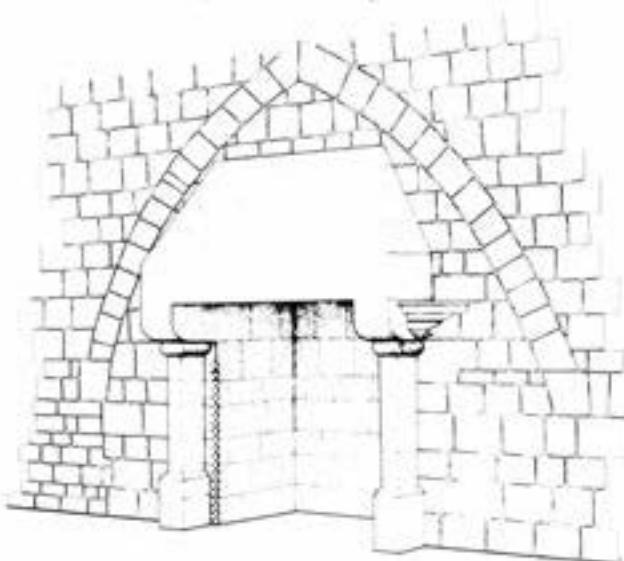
The keep; reconstruction of the fireplace on the first floor (room 8)
